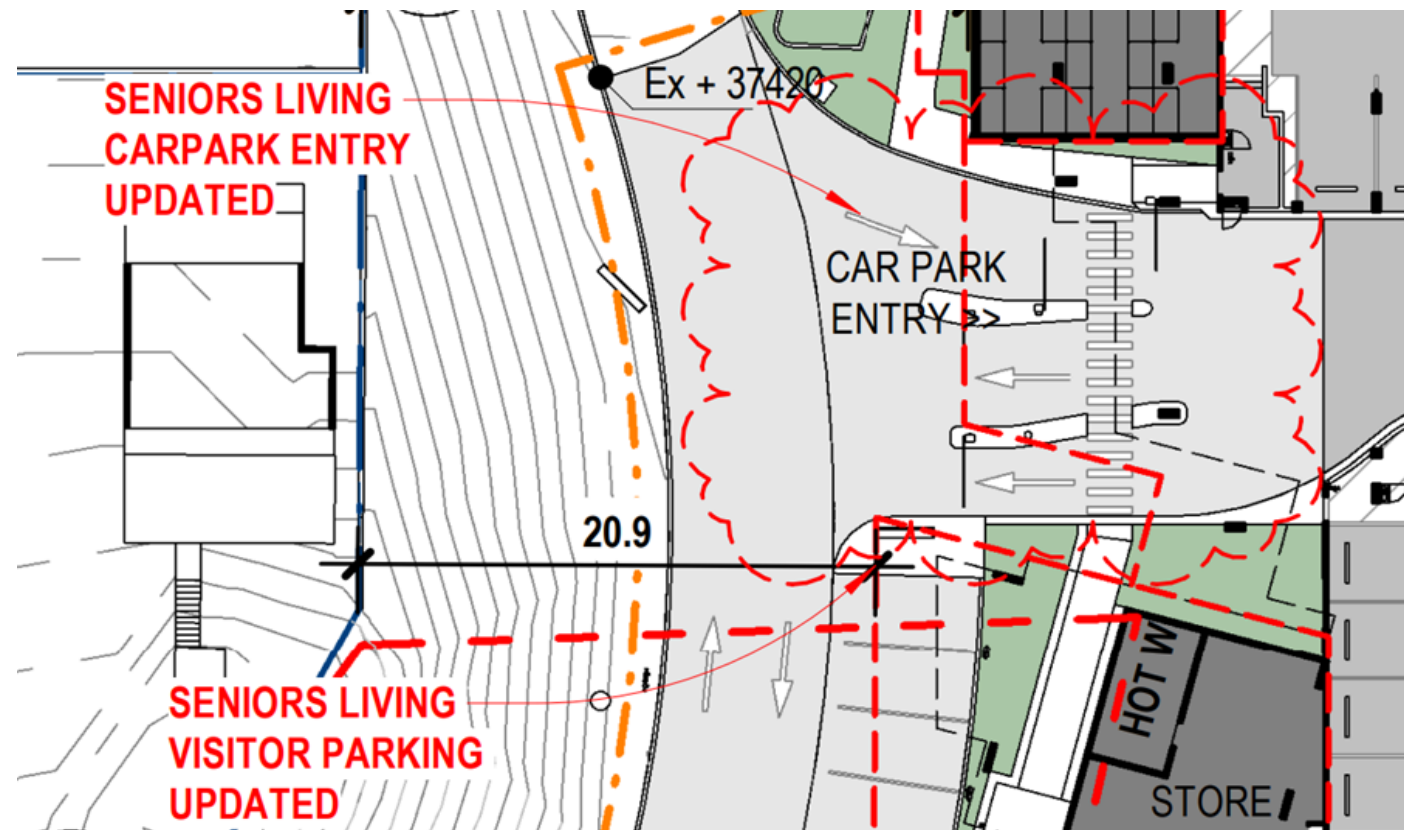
Excerpt of Level 1 plan indicating the additional exit lane to the car park entry
